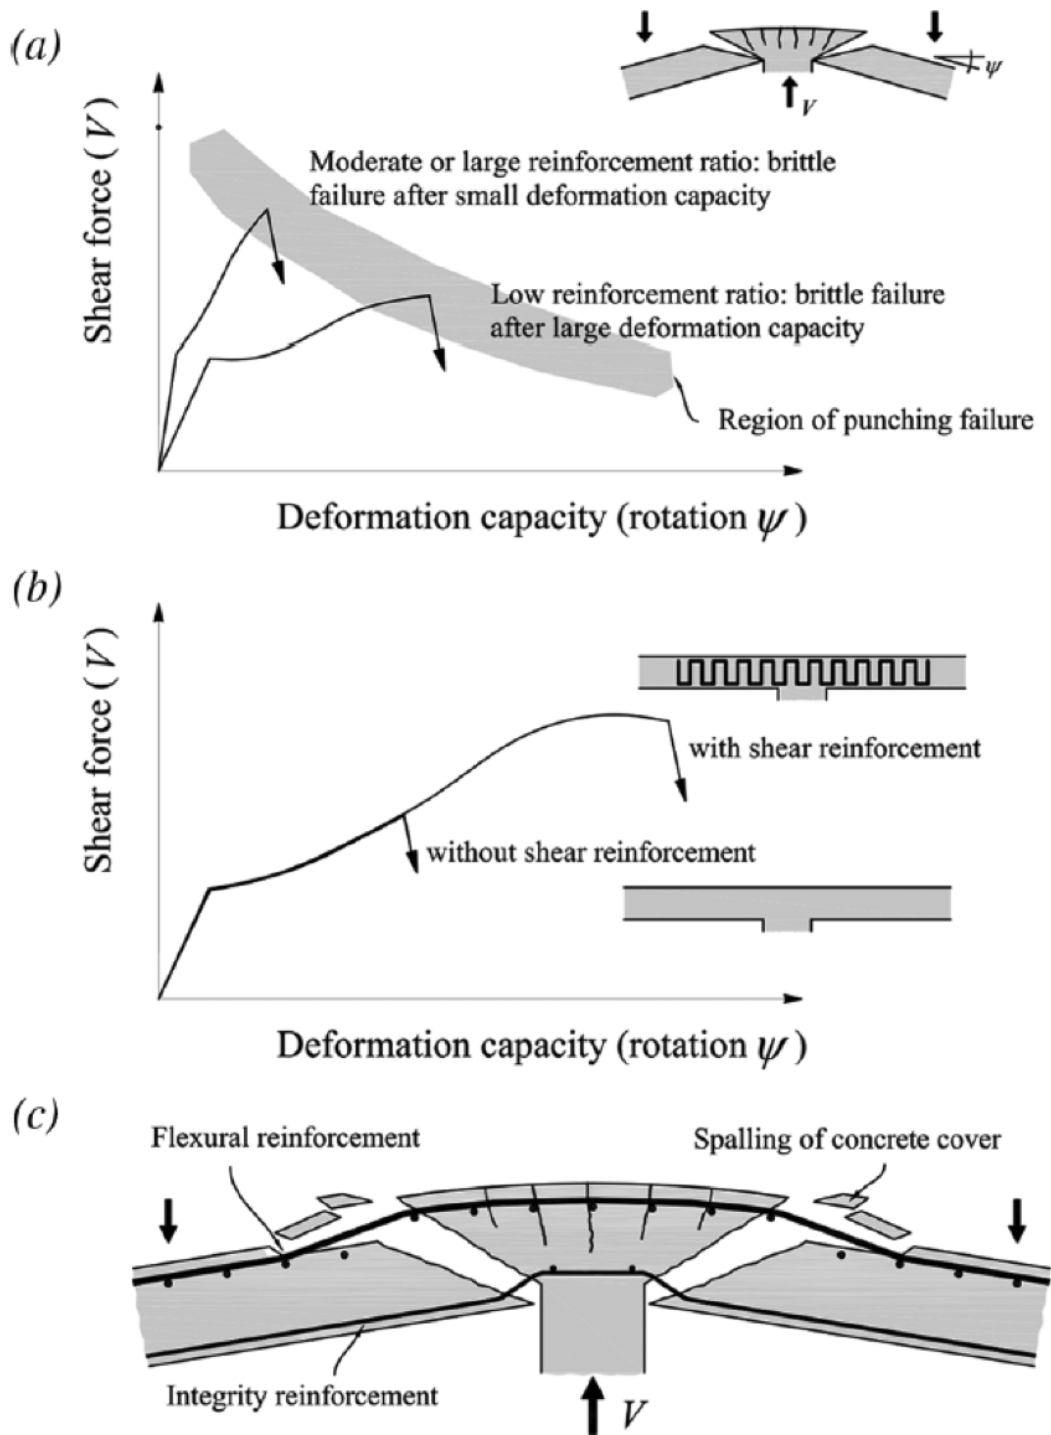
Behaviour of flat slab failing in punching shear: (a) brittle and ductile failures depending on amount of flexural reinforcement; (b) brittle and ductile failures for members without and with shear reinforcement; and (c) activation of flexural and integrity reinforcement after punching shear failure. [53]
